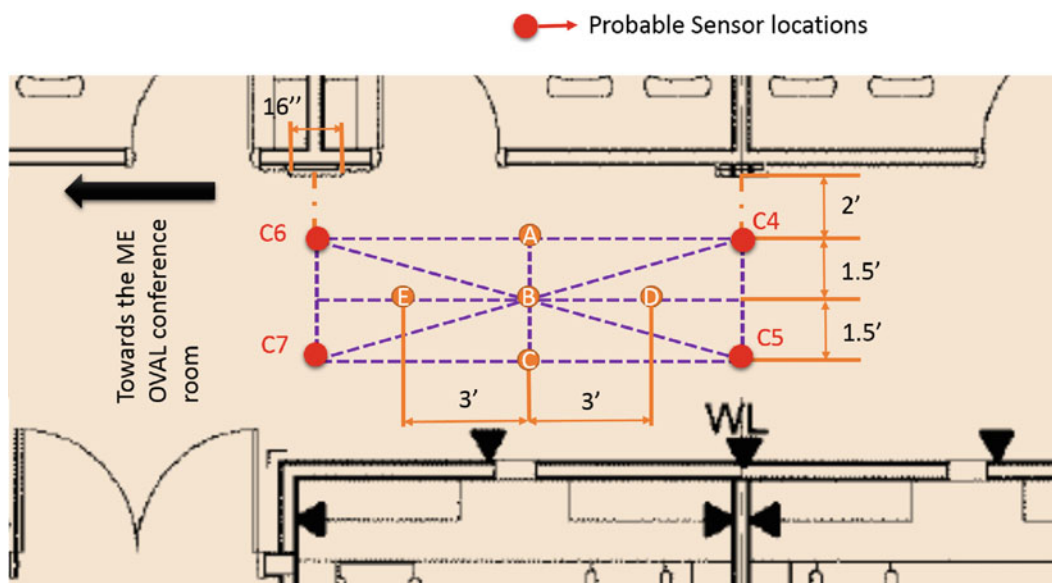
Location of various hammer hits on the floor (zoomed version of the floor plan with hammer locations)
